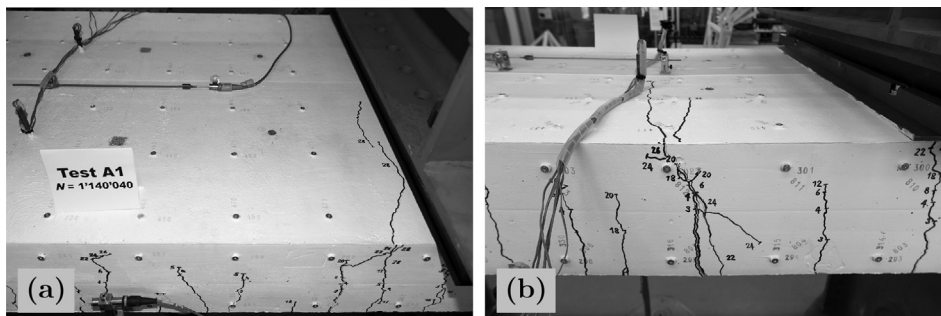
Critical cross-sections at failure: (a) test A1; (b) test A2.
